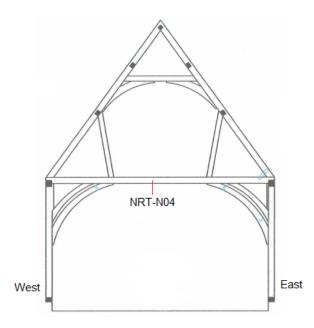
Truss 1, showing the location of sample NRT-N04 (after Tim Buxbaum Architect 2016 Drawing No 907/7)
